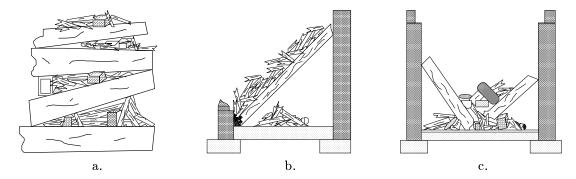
Three types of collapsed building structures - a. pancake, b. lean-to, c. v-shape
